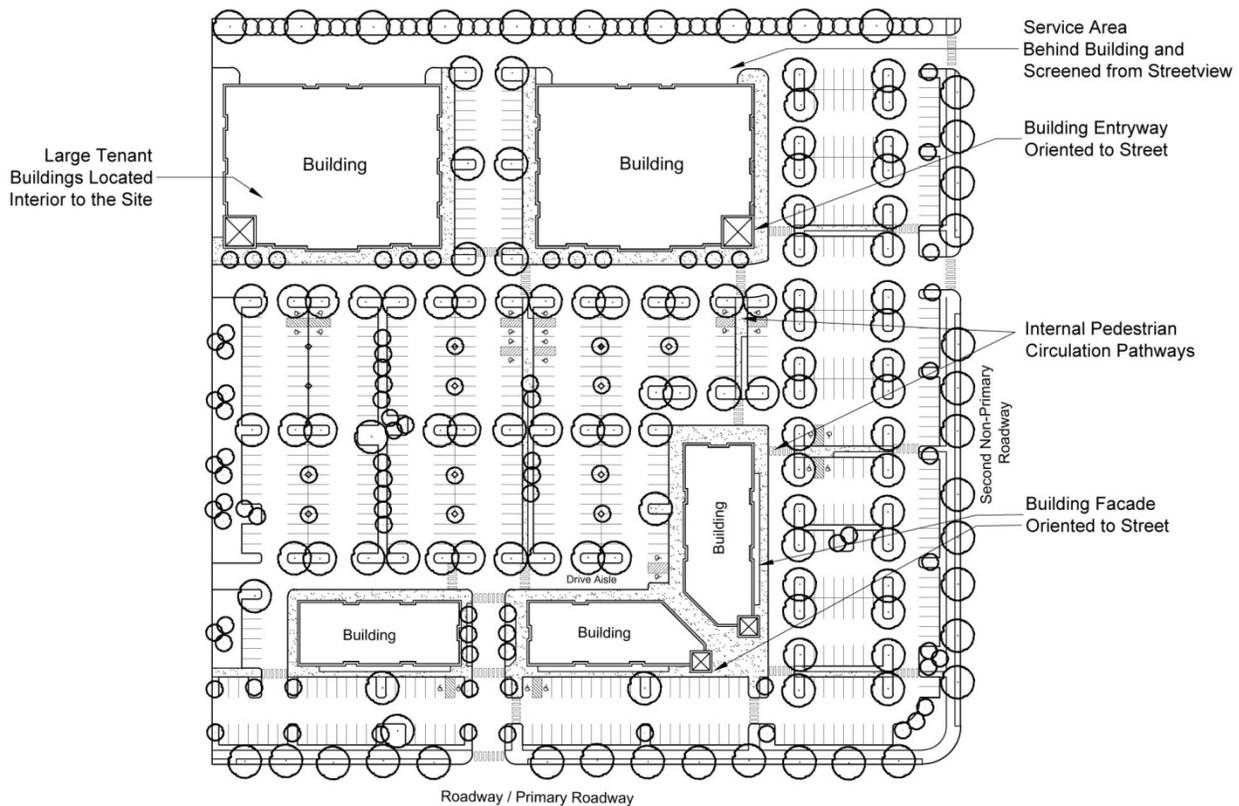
(b). – Site Layout - Building Orientation Standards
